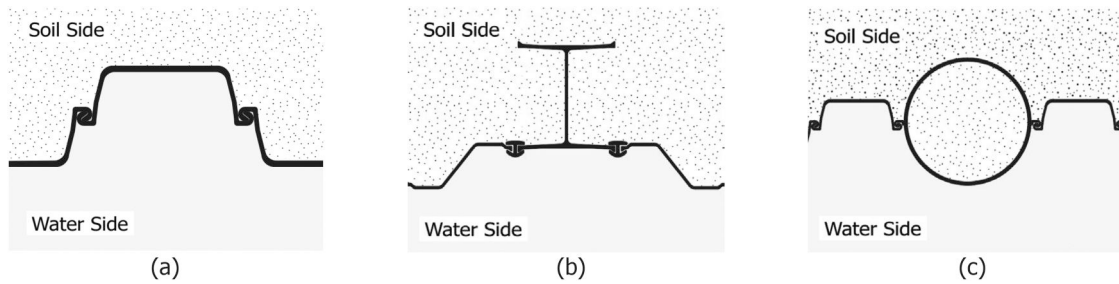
Common quay wall cross-sections adopted in the port: (a) U/Z sheet pile; (b) I-shaped beam 'combi-wall'; and (c) pile 'combi-wall'.
